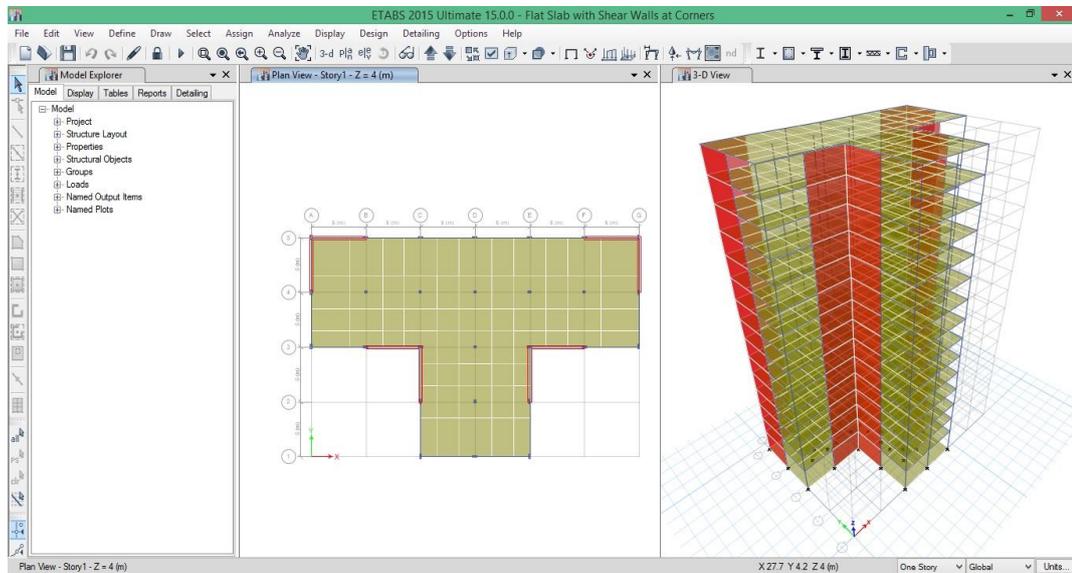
Plan & 3D view of Model-5 (Flat slab with Shear wall – FSSW)
